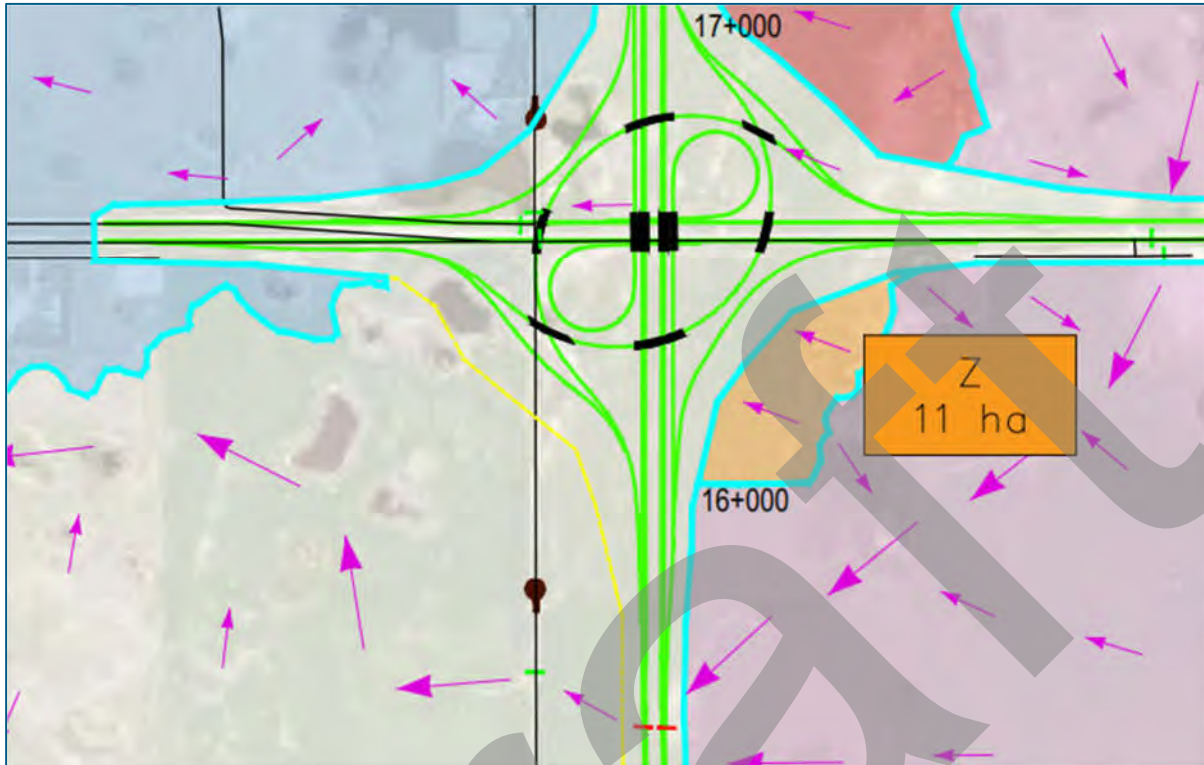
Potential exception to maintaining existing drainage – Highway 5 Interchange (from Figure 5.28)
